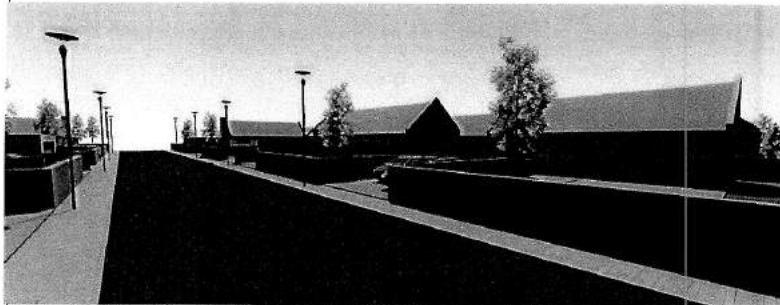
Extracts from the Architectural Guidelines showing a typical streetscape
